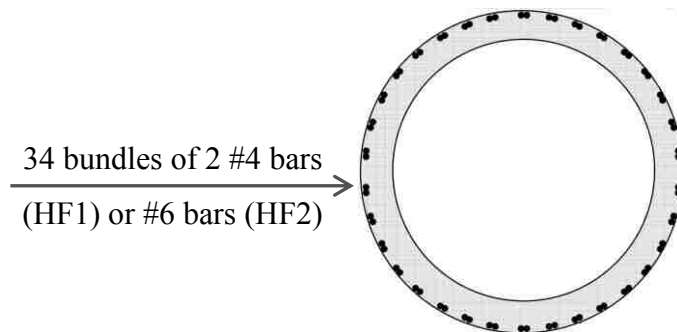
Cross-section of the hollow-core concrete column with one layer of reinforcement (Hoshikuma and Priestley 2000)
